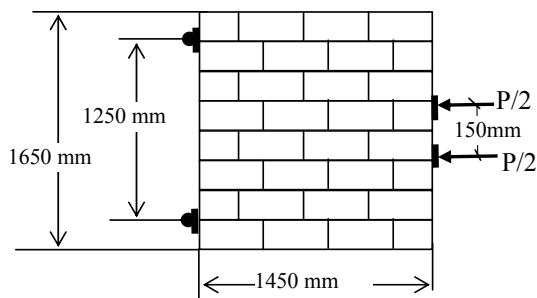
The test setup and dimensions of the in-plane laterally loaded block wall specimen.
